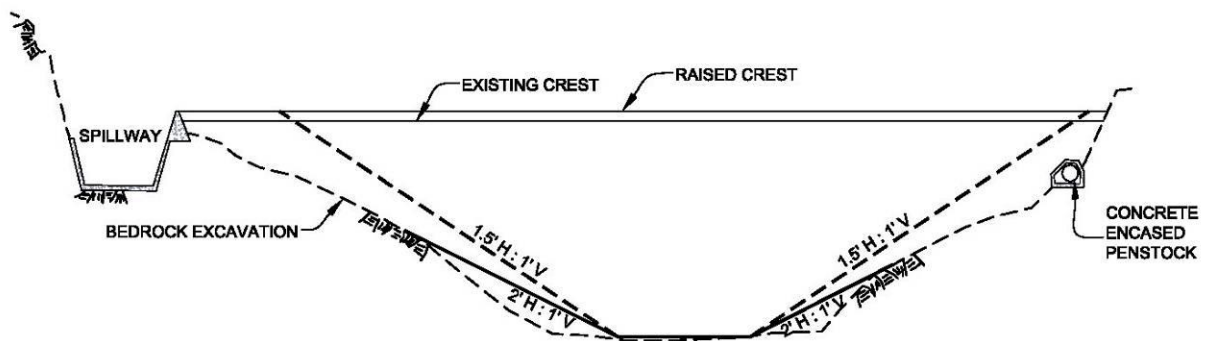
Section view of Iron Gate Dam showing 100-foot-wide bottom notch with different potential side slopes
